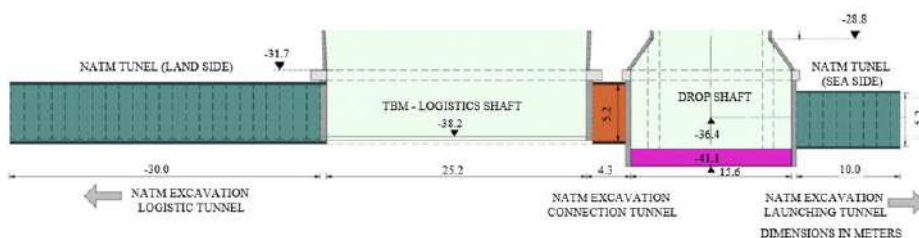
NATM tunnel sections logistics, connection and launching tunnels. (a) Longitudinal profile Logistics Tunnel, Logistics Shaft, Connection Tunnel, Drop Shaft, TBM Launching Tunnel.
